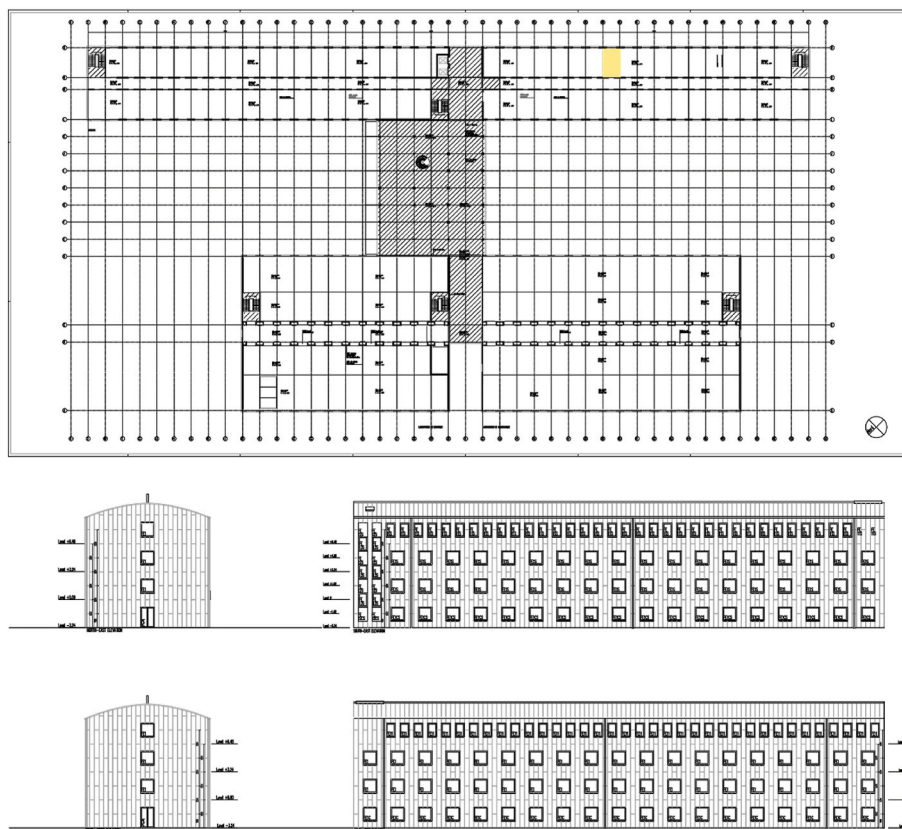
Plan of the typical floor and elevations of the building B52 of the University of Liege. In yellow the studied office.
